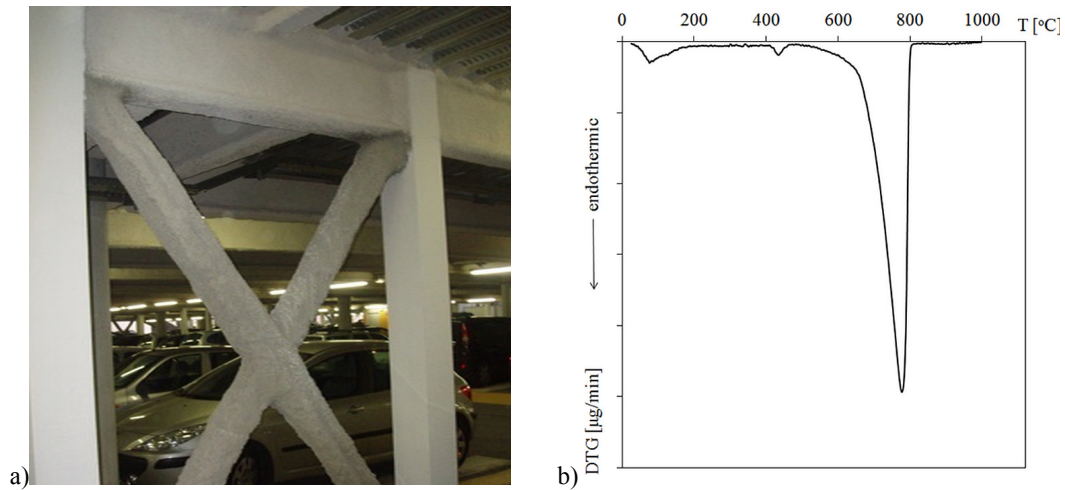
(a) Passive fire protection of steel structure, a fireproofing material sprayed onto steel structure elements; (b) endothermic reaction of concrete with dolomite aggregates, (Differential Thermal Gravimetry - DTG, sample weight 20 mg, heating rate 20°C/min).
